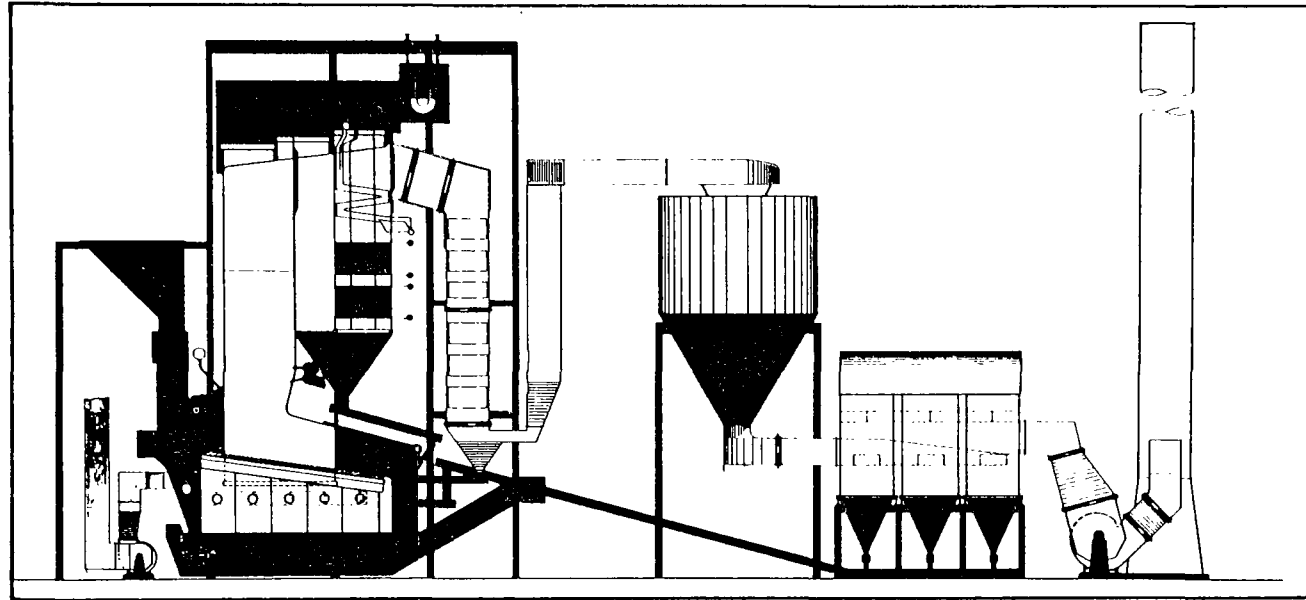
Boiler cross-section of CE design using db grate and EVT boiler.
